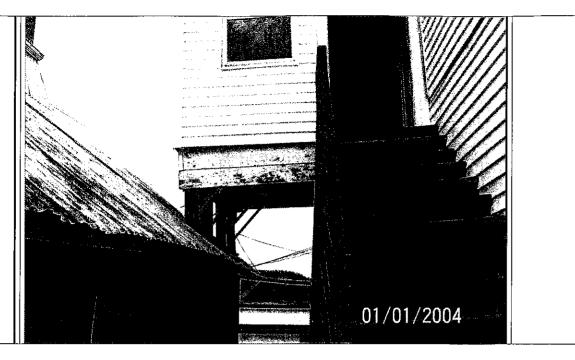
04/27/05 -Two Car Garage (Building #17): Deterioration of sheet metal façade
